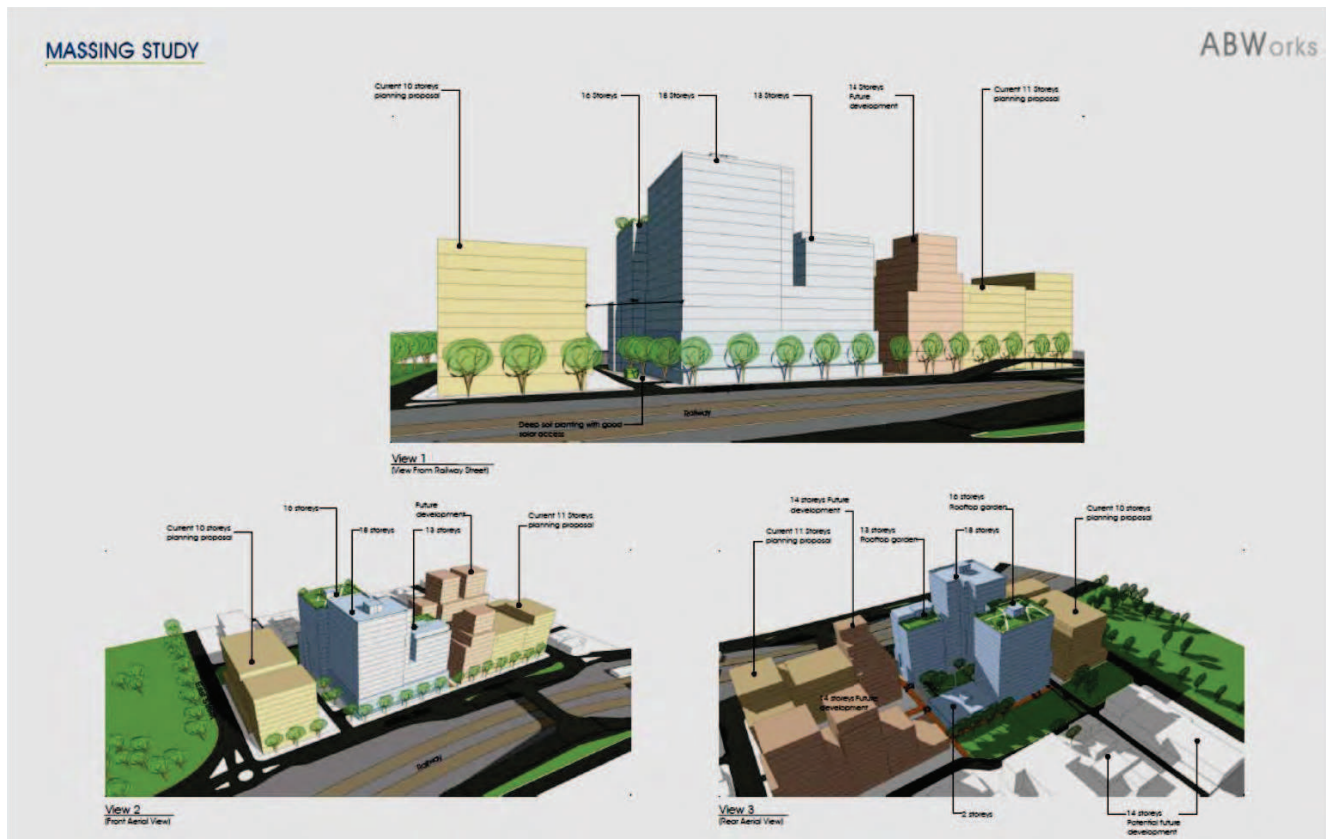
indicative concept – potential massing (source PPR Plans page 10)
